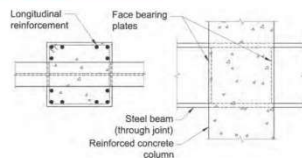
Reinforced concrete column-to-steel beam moment connection.
